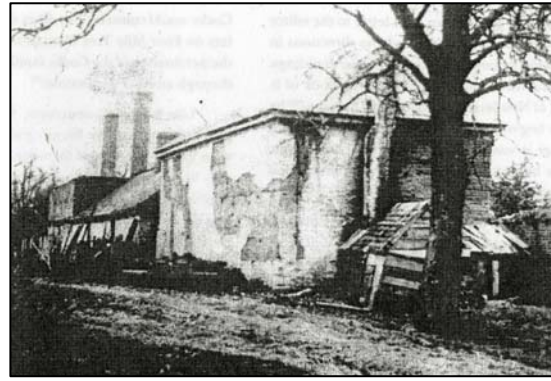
Bushrod Washington's greenhouse made out of pisé. (Image: Gardiner Hallock)
